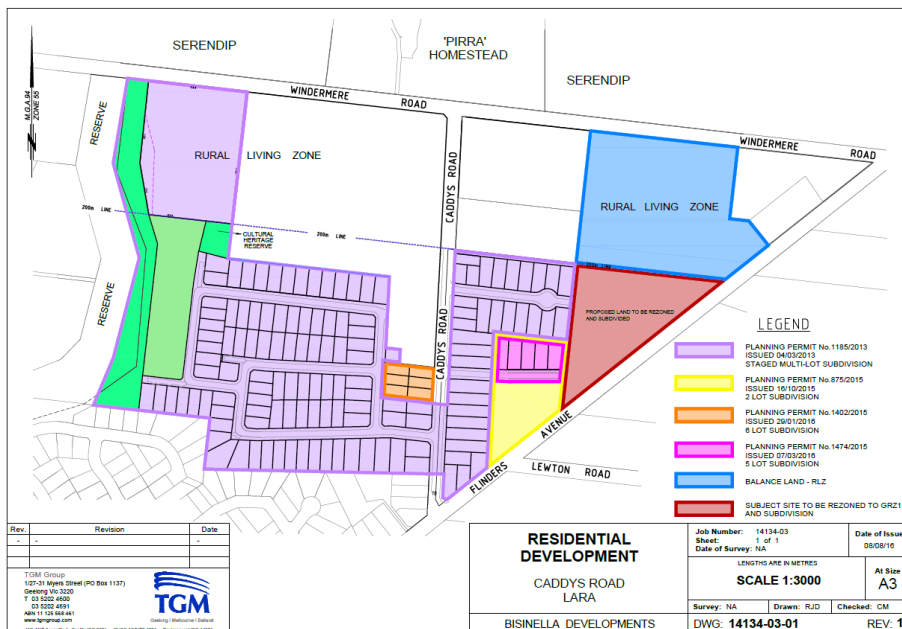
Plan of Recent Subdivision Permits (see Attachment 2).
